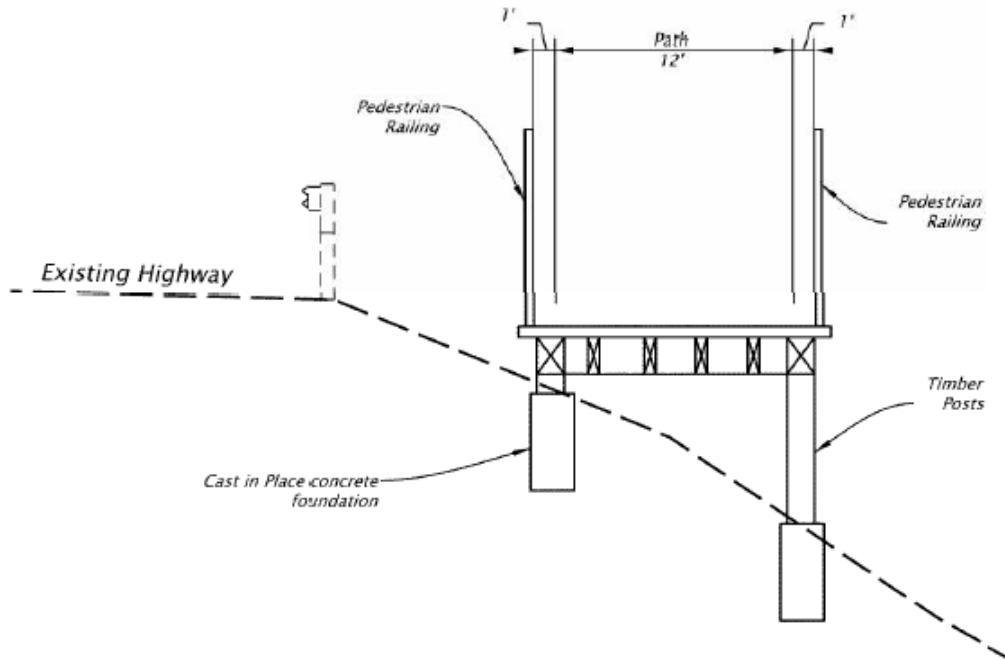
Alternative C3 Elevated Boardwalk Typical Cross Section
